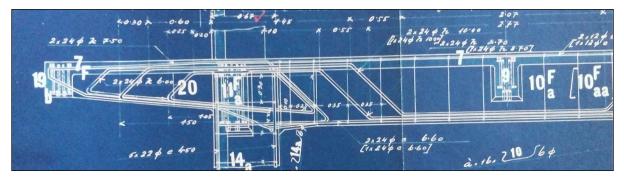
Reinforcement details of a primary beam - end span in transversal direction including cantilever [5]
